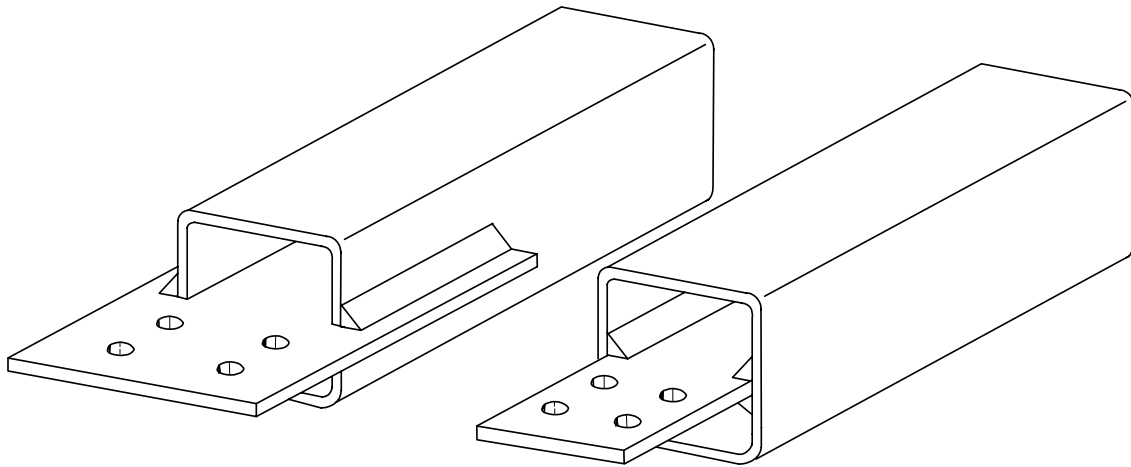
Standard gusset plate connection (left) and hidden joint connection (right)
